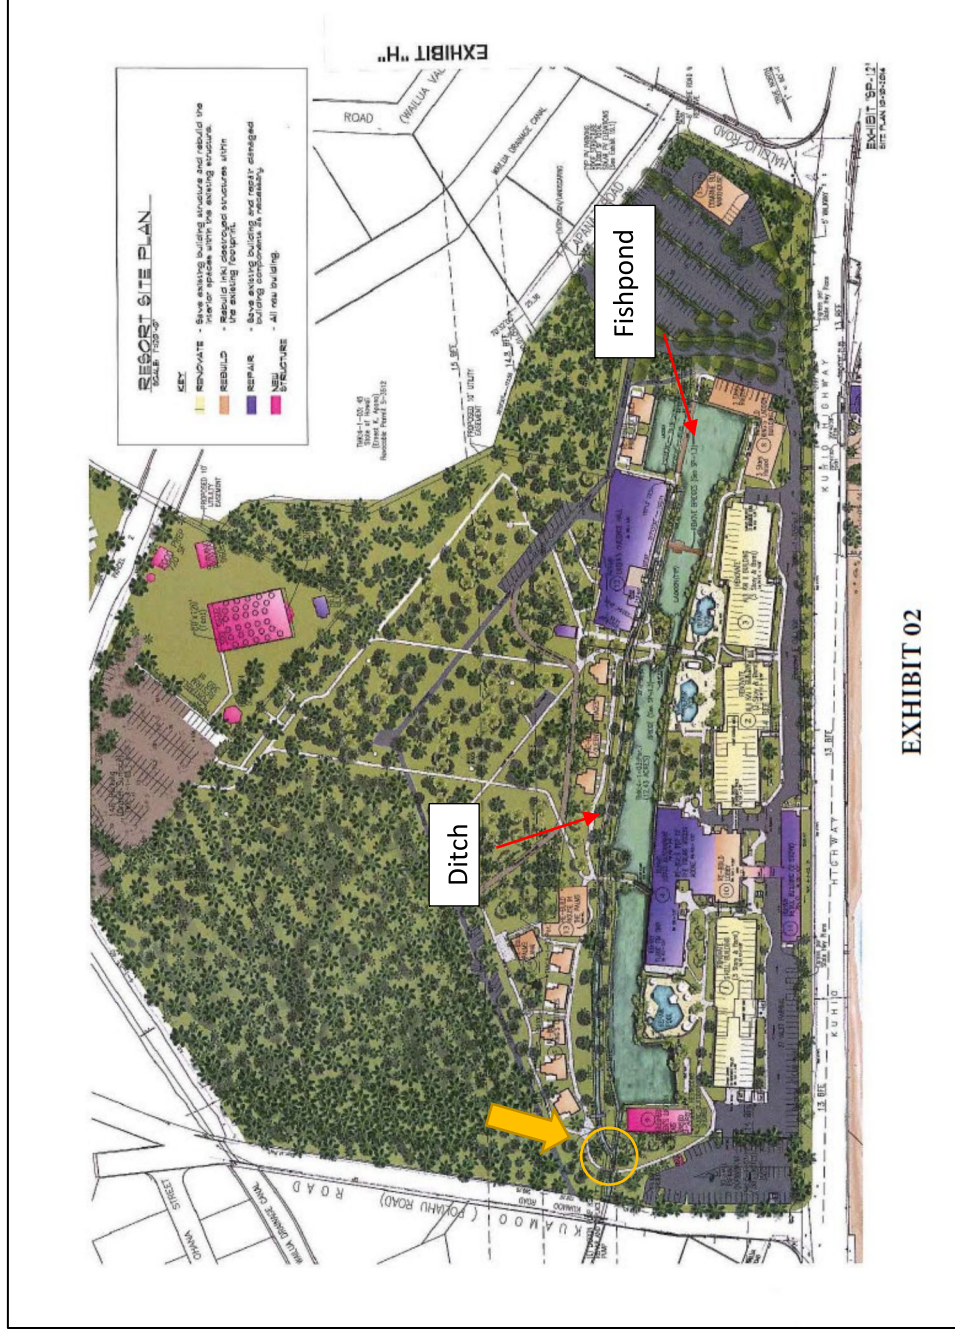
Copy of the site plan for the Coco Palms Resort located at 4-241 Kuhio Highway, Kapaa, Hawaii 96746. Note that the state-owned drainage ditch connects to the fishpond before leaving the Site (yellow arrow and circle). Image provided by RP21 Coco Palms.
